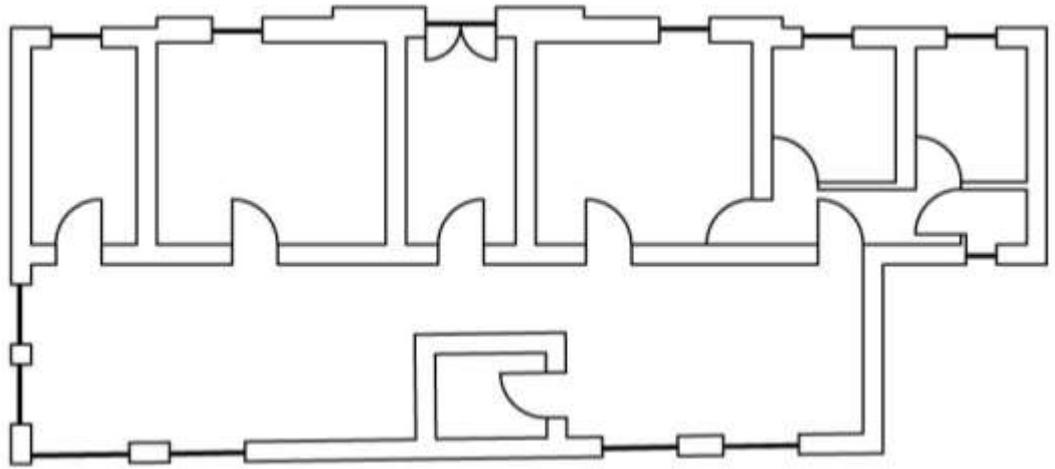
Ground floor plan of the house at 122 lot 14 parcel
